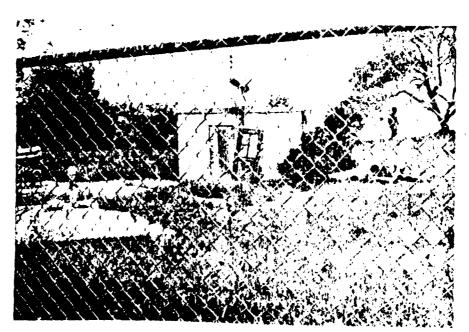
Location "A" Elberta Beach. Looking north, existing pump station.
